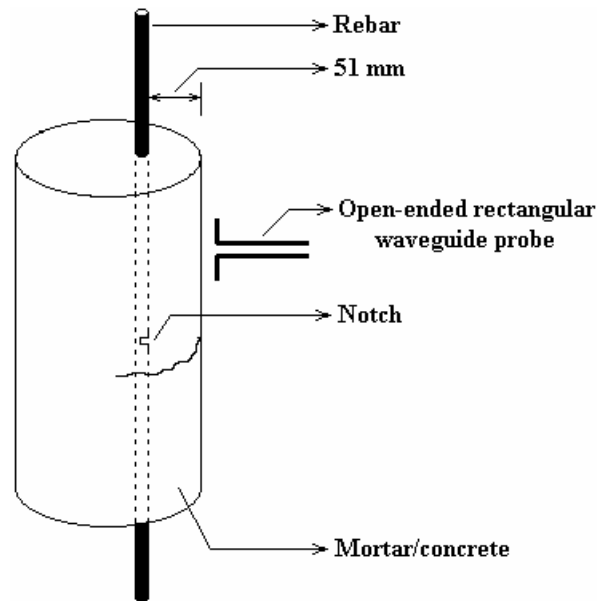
Schematic of a load-induced crack at the location of notch on rebar.
